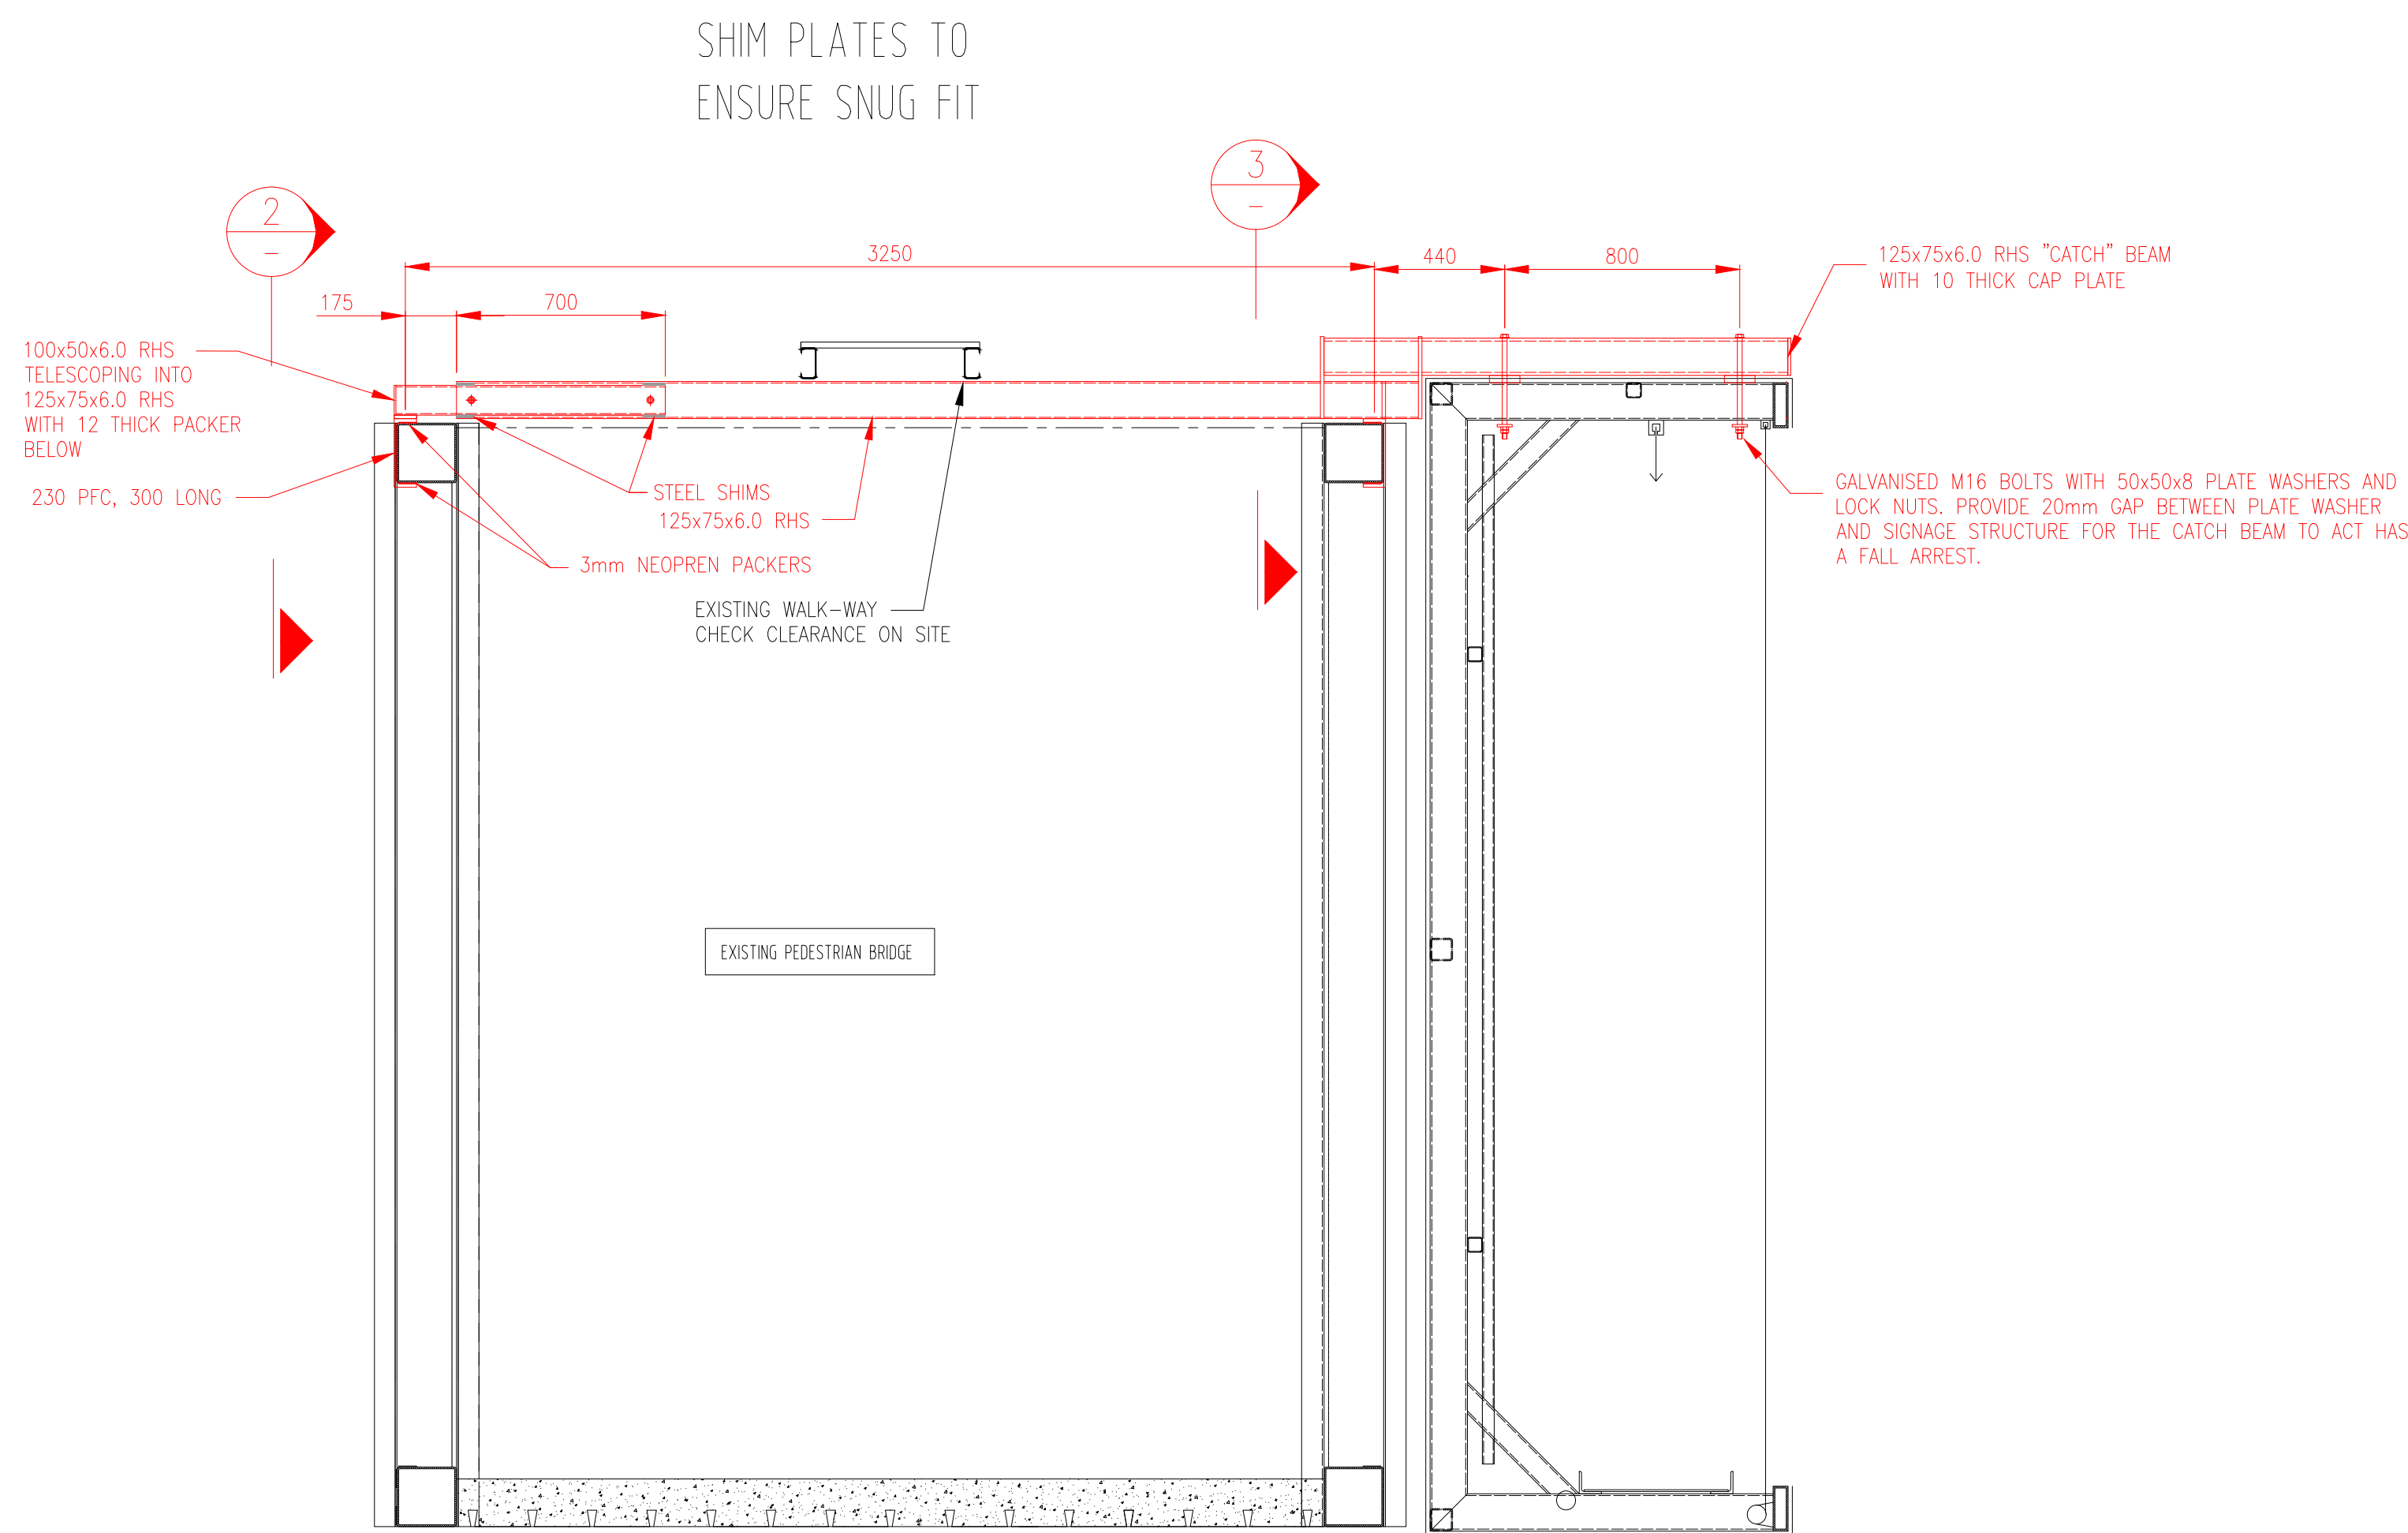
DETAIL A: - SIGN REAR FRAME AND BRIDGE ELEVATION
